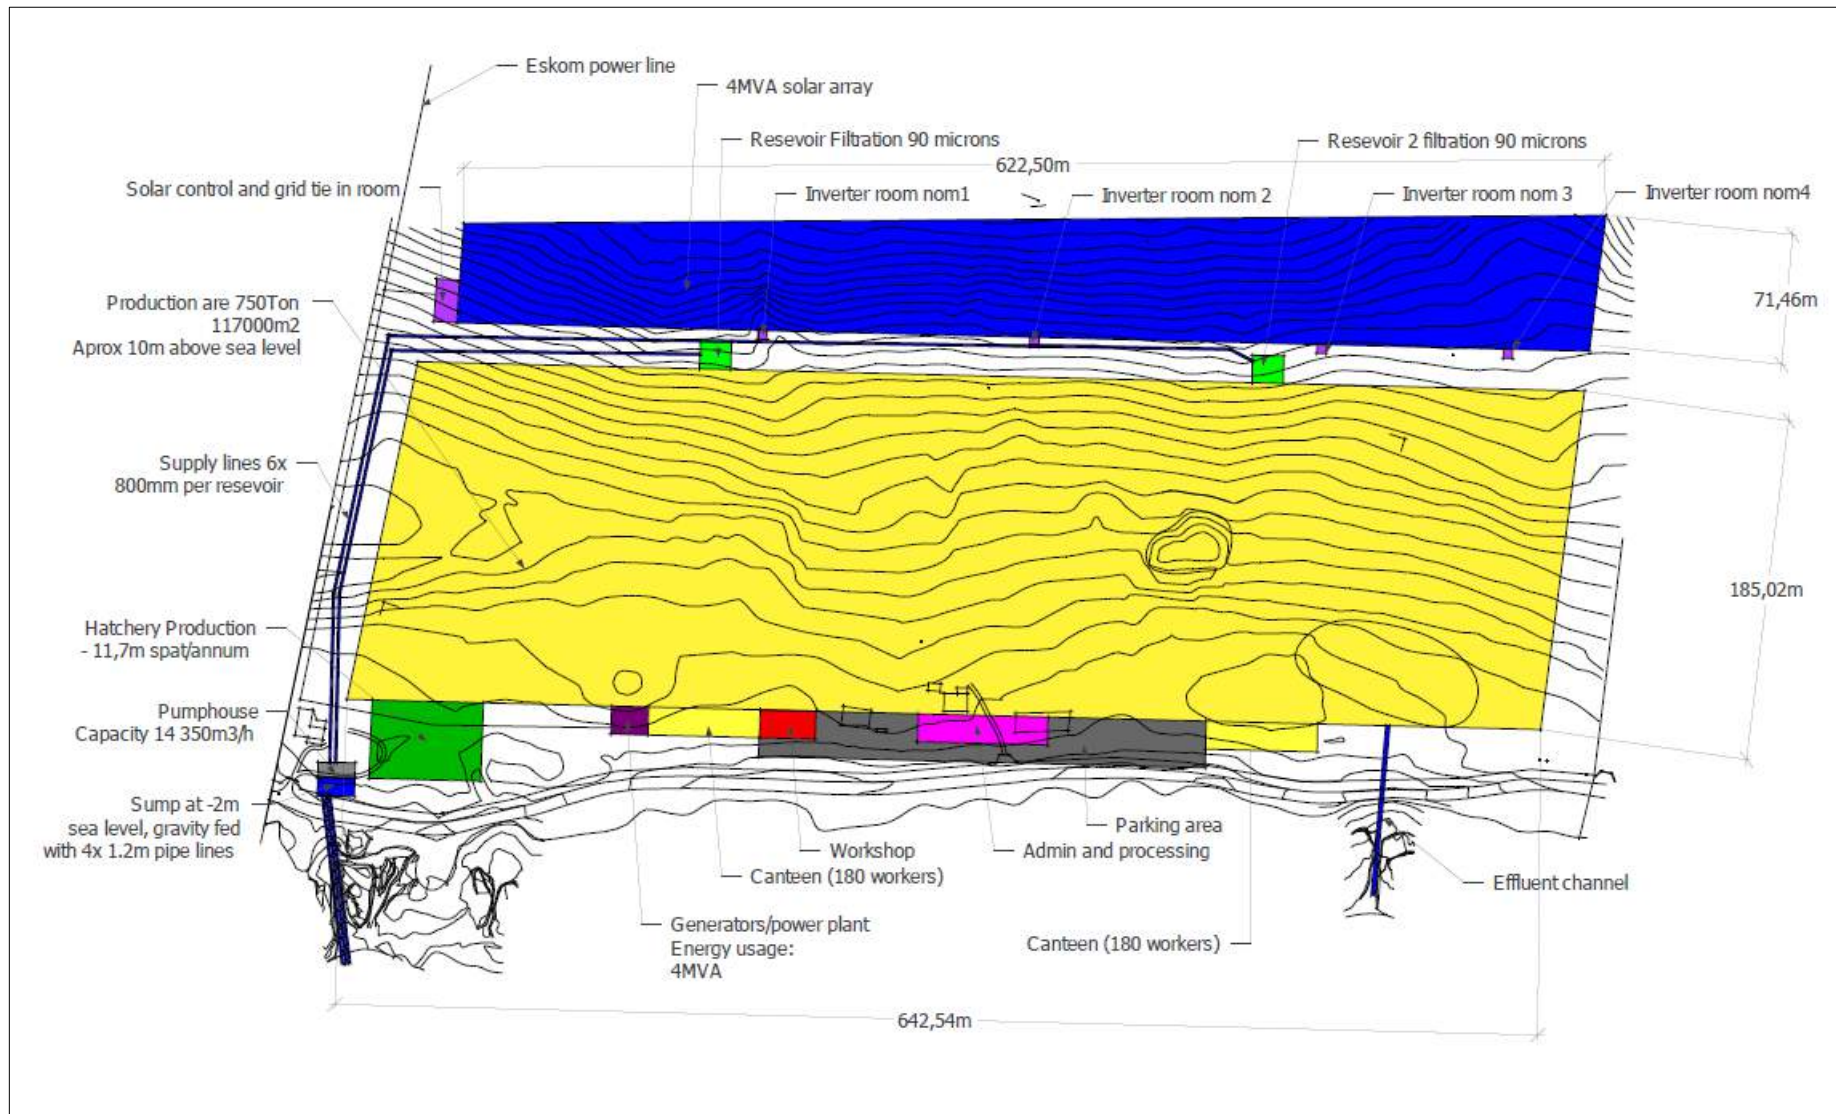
Gouritz Abalone Farm: Proposed site layout plan (Alternative 1)
